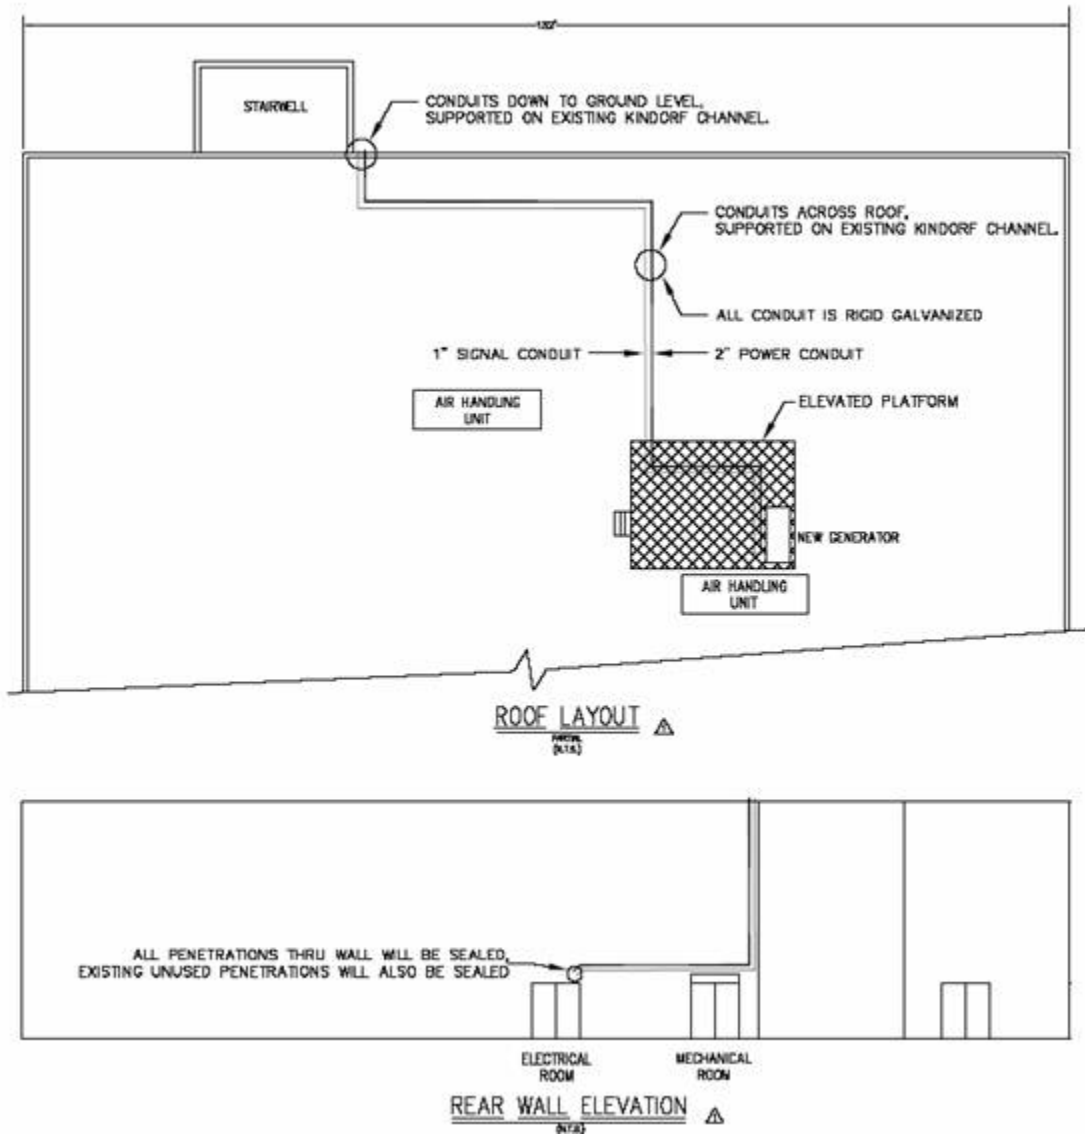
Conduit Layout on the Roof of the Chesapeake Building
